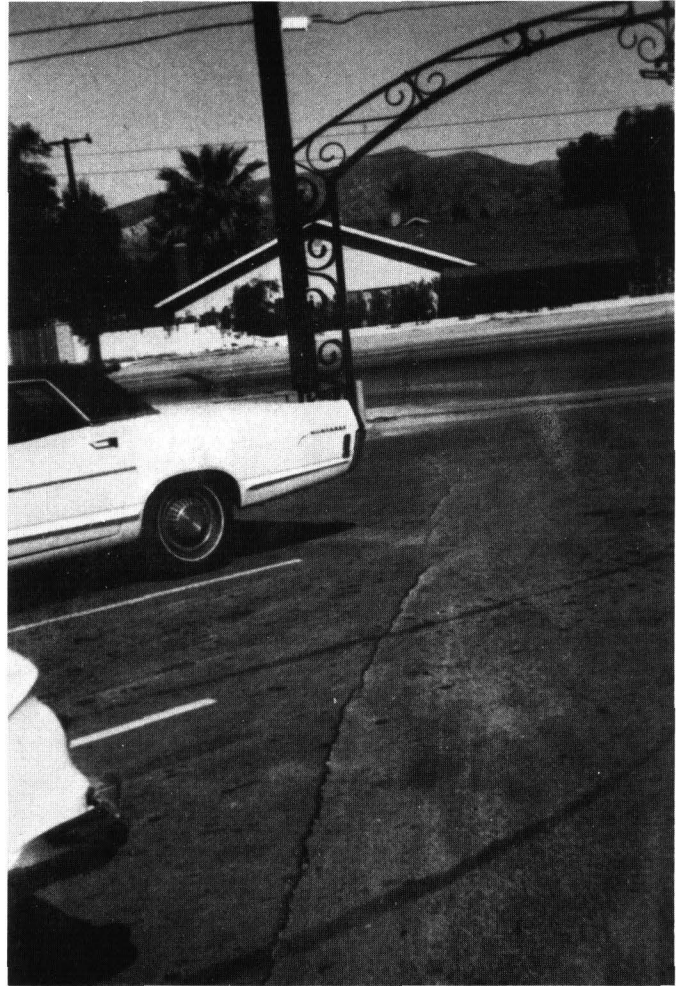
Crack in paving. North Oaks Shopping Center.
